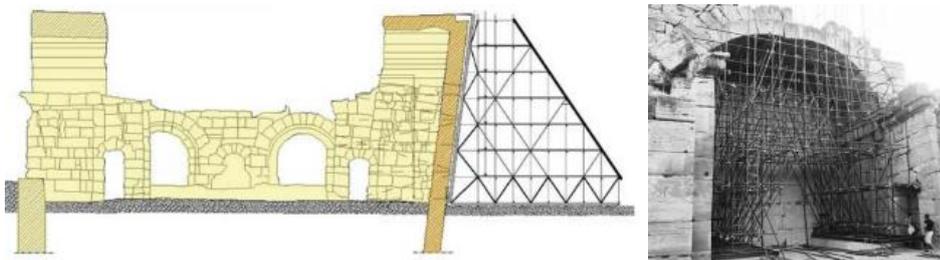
Structural consolidation of the eastern wall of the Baths-Basilica (MAIER 2007:8), and the vault (D'Andria 2015:216)
